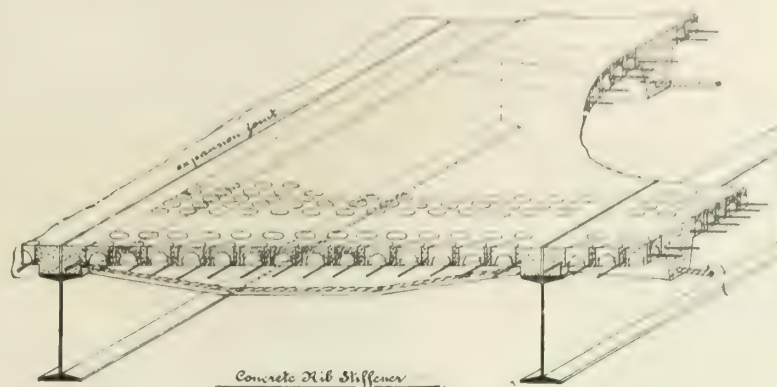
SIDEWALK VAULT LIGHTS, PERSPECTIVE
